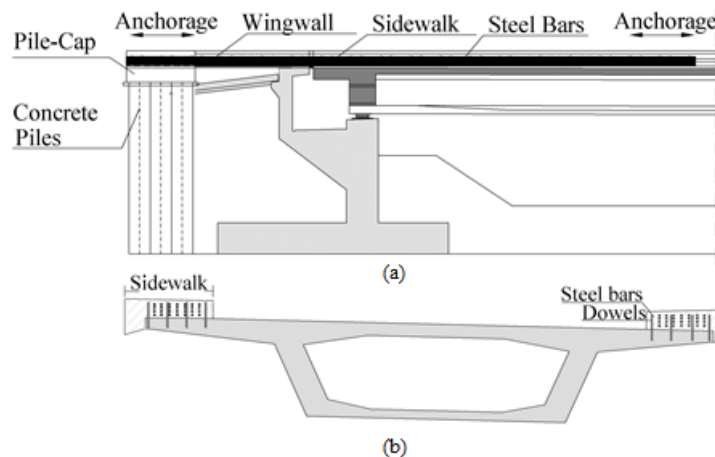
a) Indicative Longitudinal Elevation, c) Indicative Cross Section Detail
